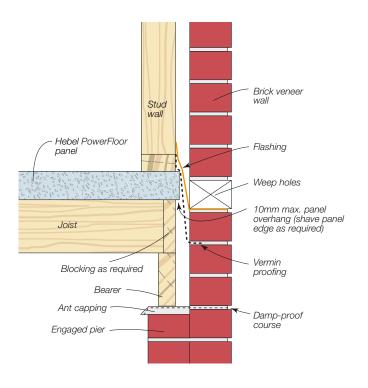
Edge Blocking Detail Between joints, with Hebel PowerFloor and Hebel Low Rise External Wall System
